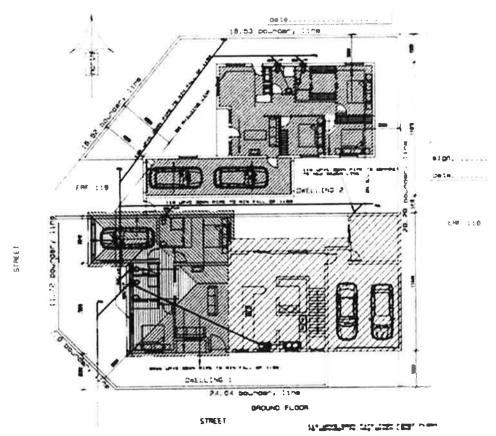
Site development plan for Erf 119, Myl 4 Proper (Credit: Shilongo Building Designs).
